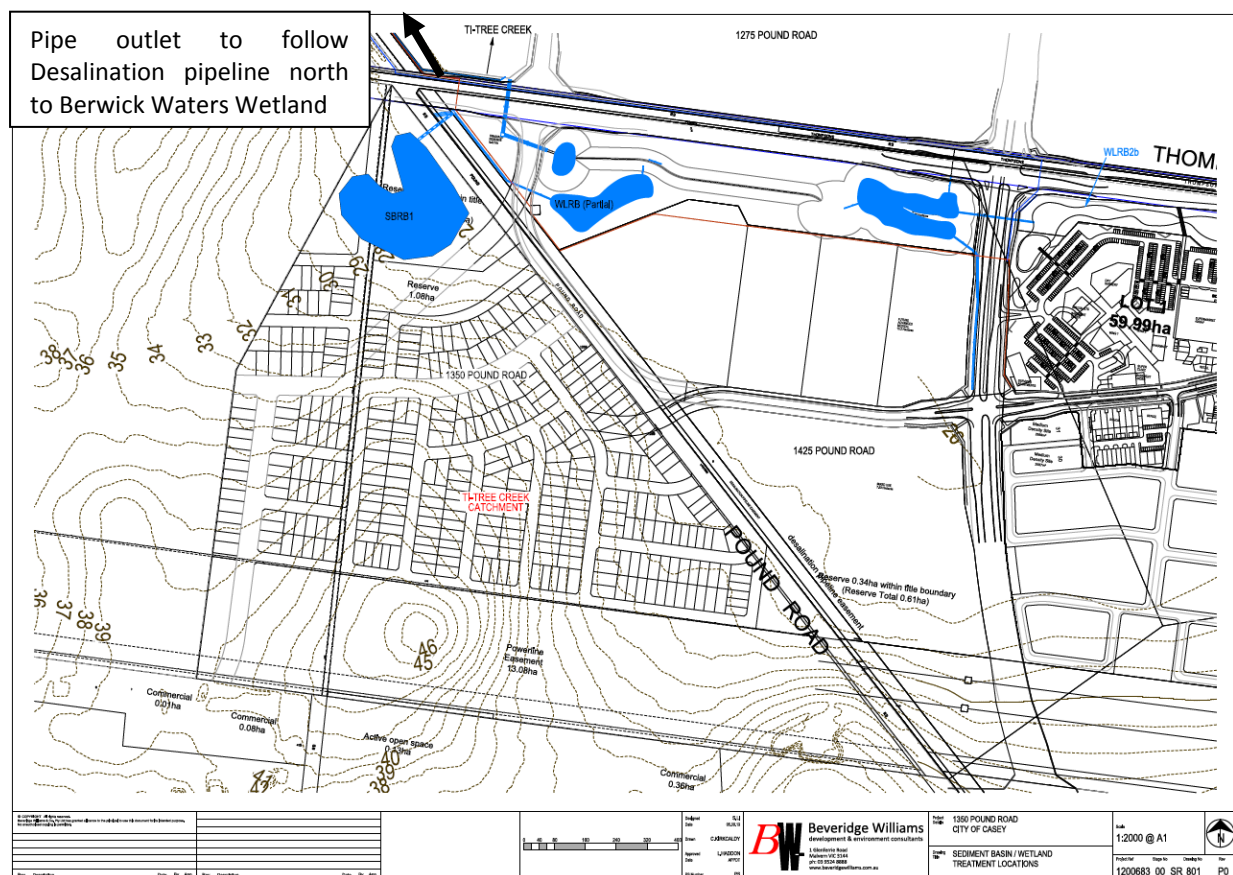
Sediment Basin on site and External Wetland Concept Layout.
